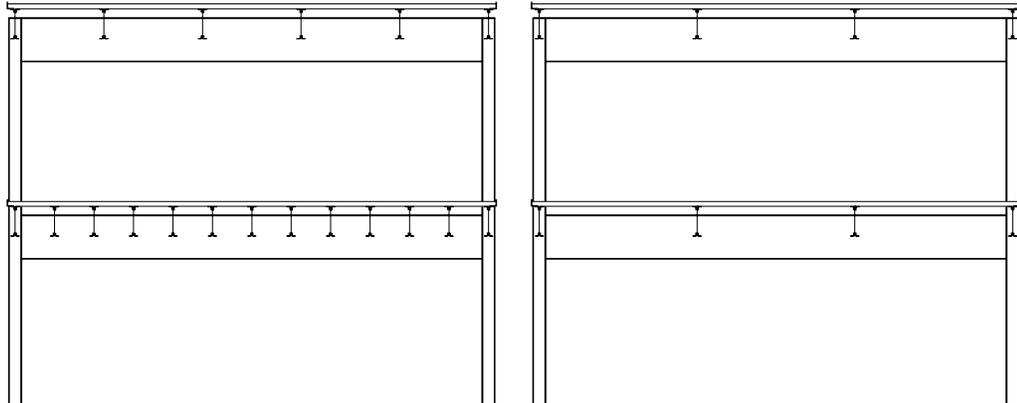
“Narrow” floor and roof joist spacings vs. “Wide” floor and roof joist spacings on the right
